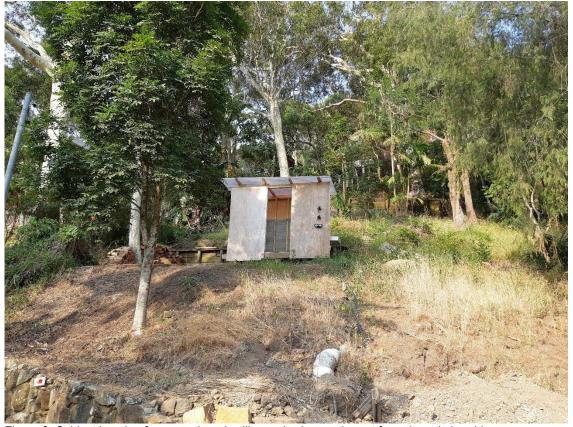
Subject location for secondary dwelling – viewing north-east from the existing driveway
